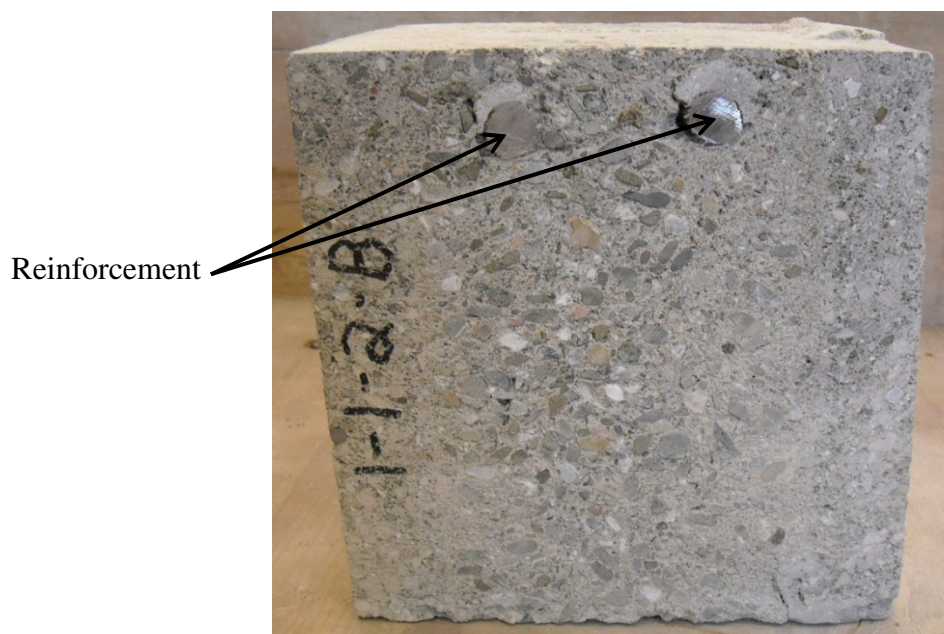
Figure II: Cross Section of Reinforcement Specimen 1-1-2-B
